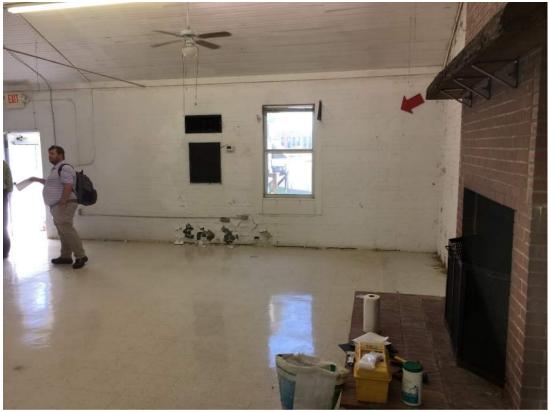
South Room, Viewed from Southwest Corner to East Wall
